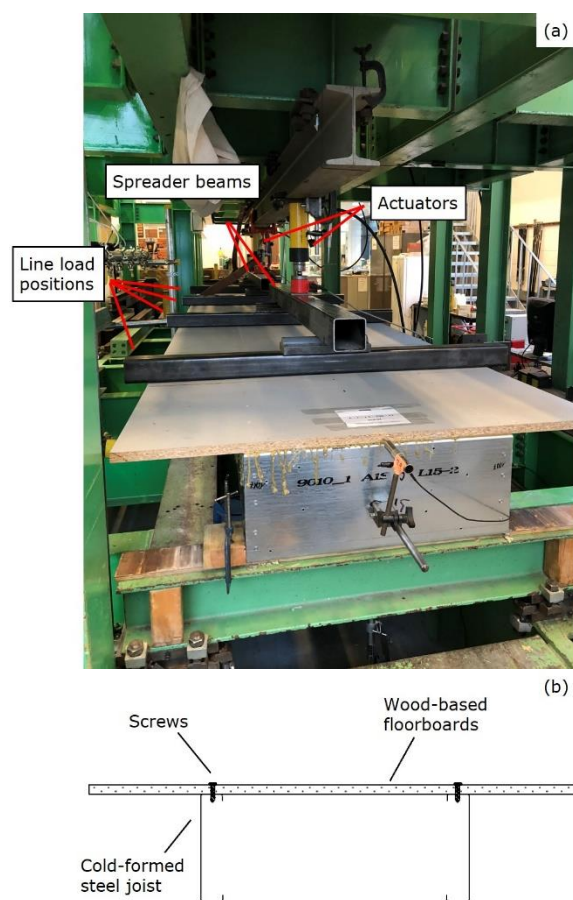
(a) Typical test setup, (b) cross-section of floors with boards
